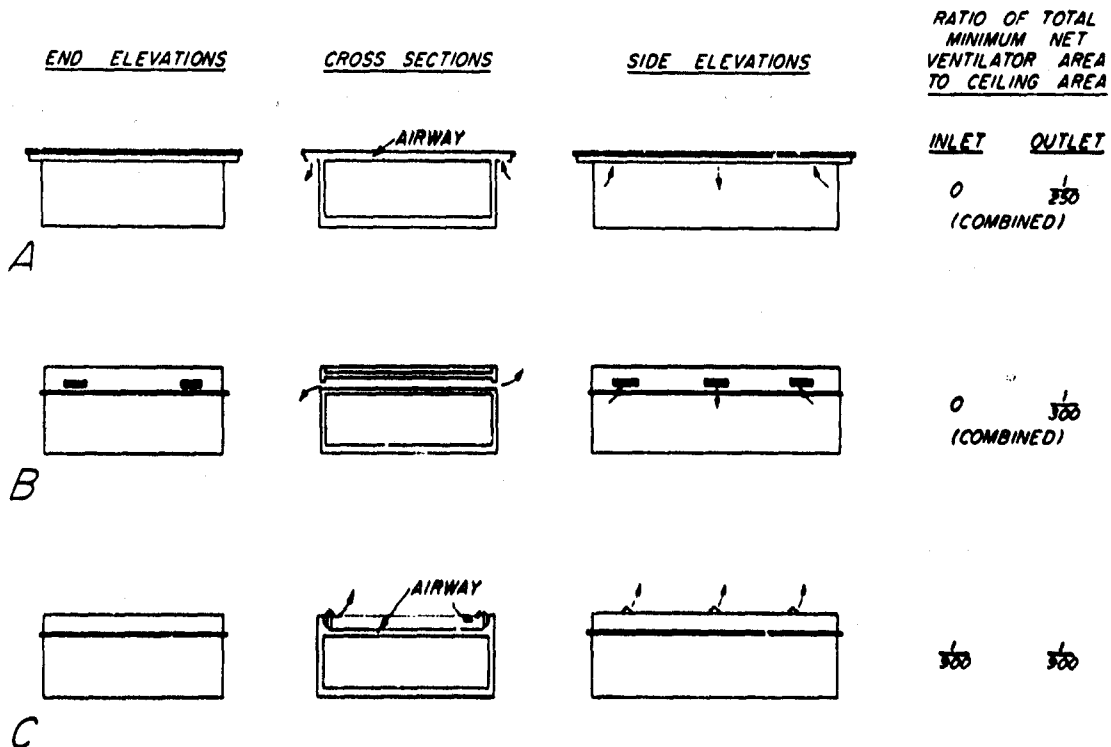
Ventilating area of flat roofs: A, Ventilator openings under overhanging eaves where ceiling and roof joists are combined; B, for roof with a parapet where roof and ceiling joists are separate; C, for roof with a parapet where roof and ceiling joists are combined. M 87627 F
